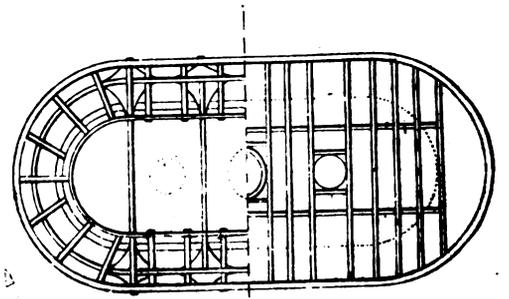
HALF HORIZONTAL PLAN AND SECTION.
